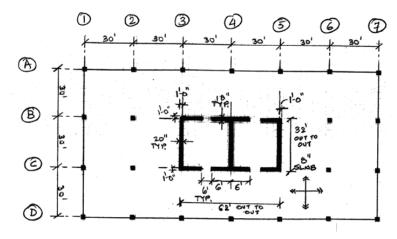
Plan View of The 12-story Building with Special Core Walls (Haselton et al., 2006b)
